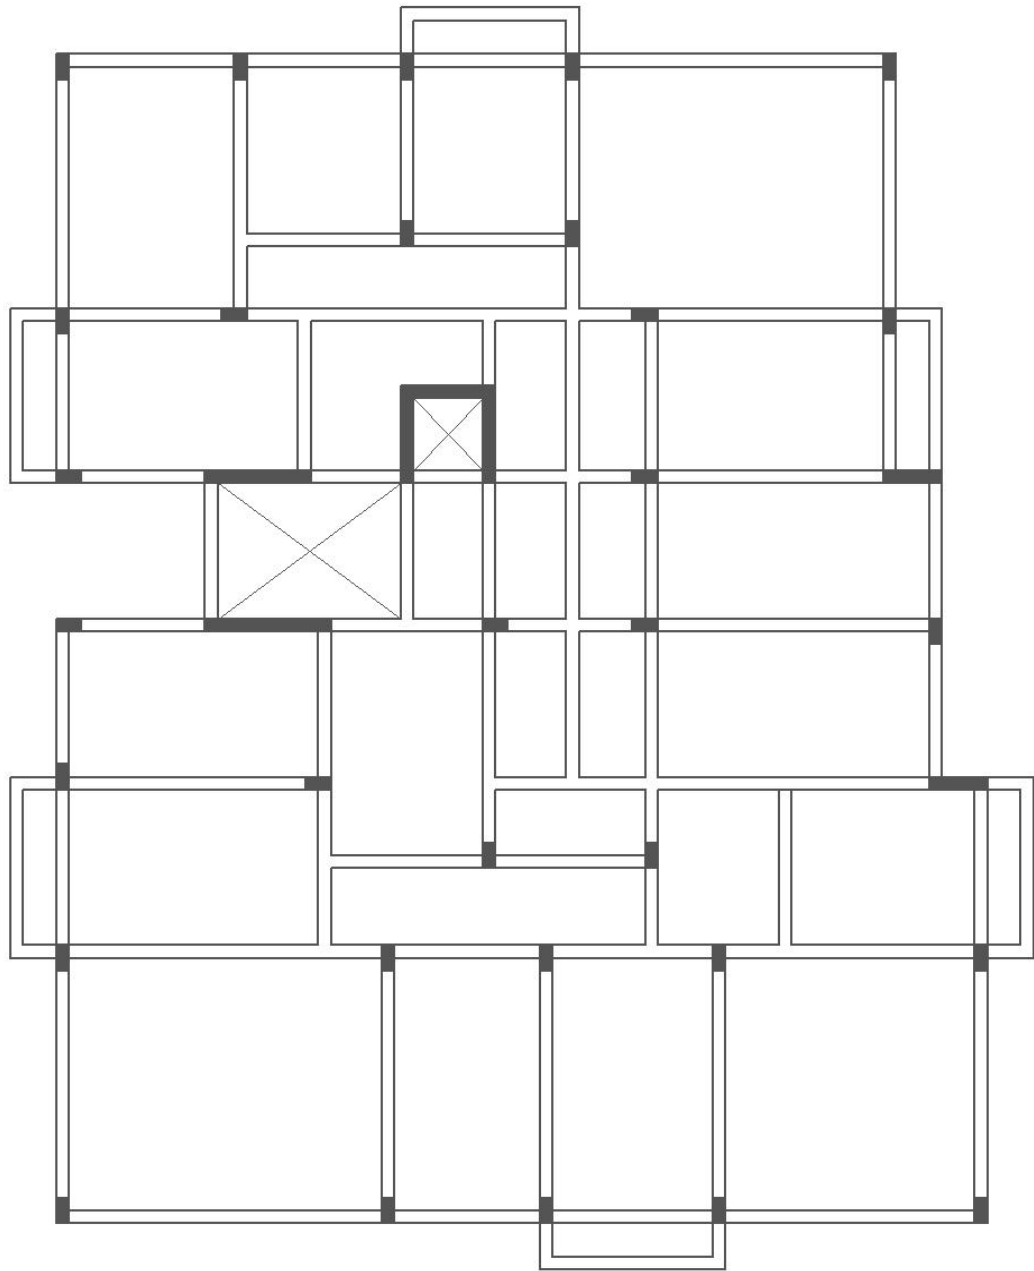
Structural Plan of Model-2 with Irregular Structural System
